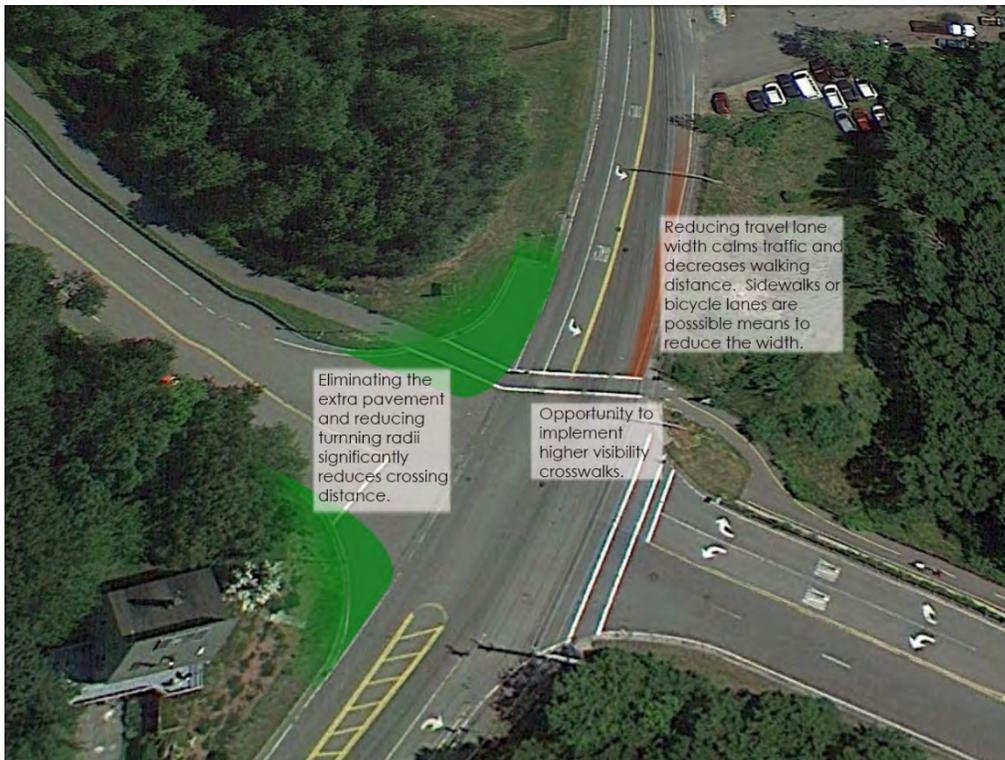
Potential improvements to ARRT Crossing at Fitchburg Street
